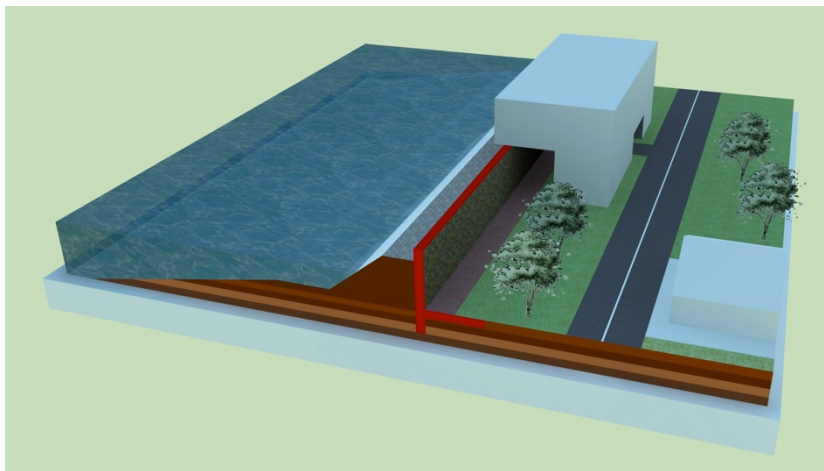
L-Wall (indicated in red) with a building against it. This does not show the tunnel variant.
